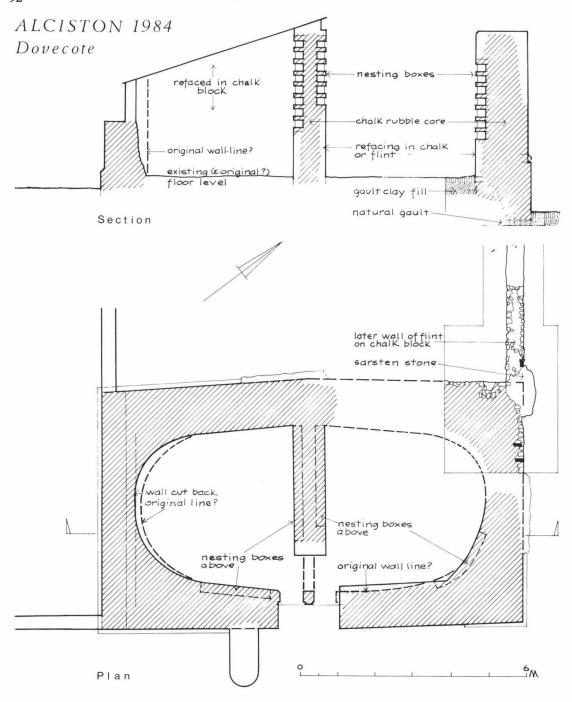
Dovecot: plan and section. The hatched work shows the original surviving structure.
